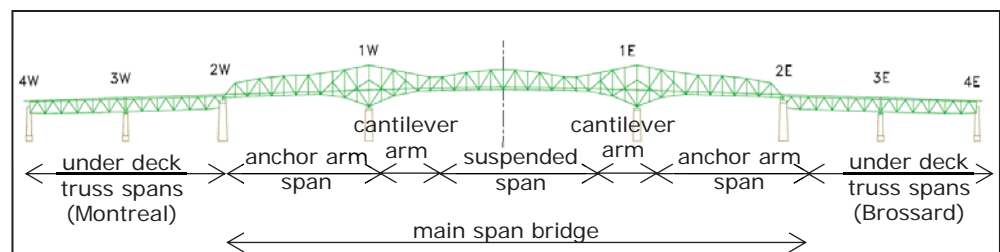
General Arrangement of the Steel Truss Spans in Section 6
